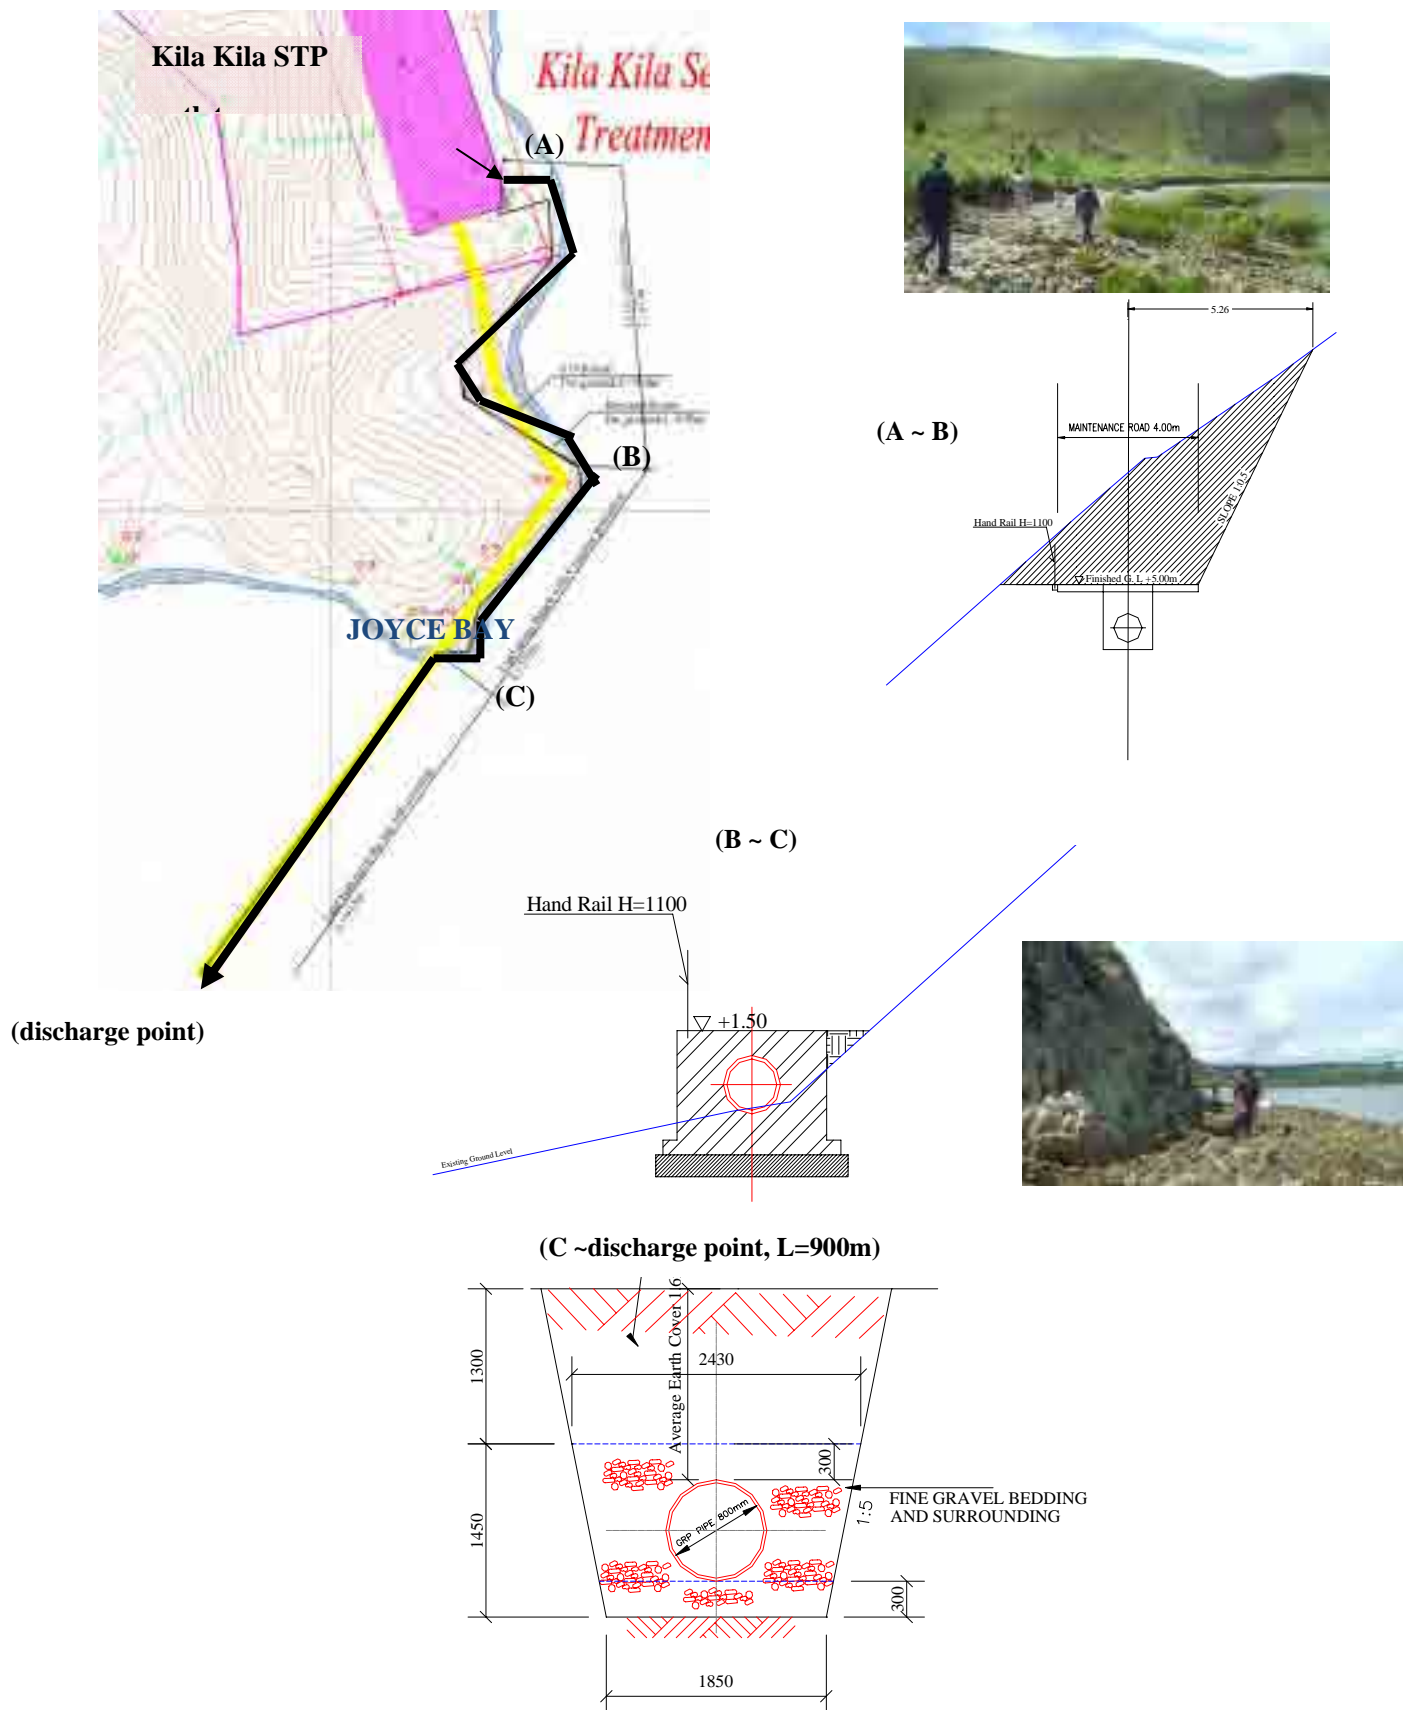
Ocean Outfall (Discharge Pipe) Plan
